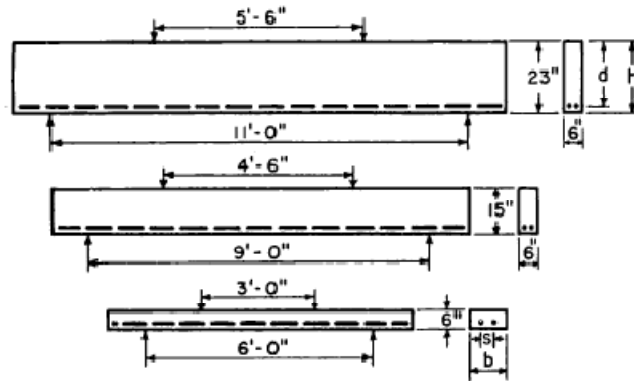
Dimensions of Clark's Specimen and Type of Loading (Clark, 1956)
